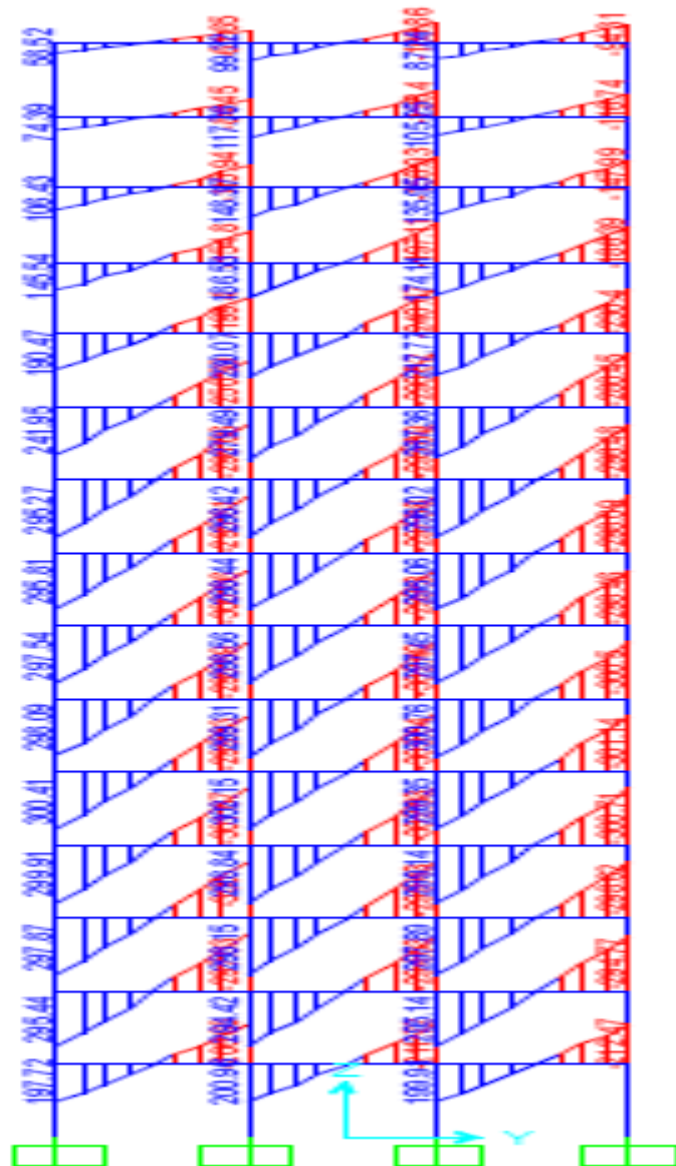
BENDING MOMENT DIAGRAM FOR THE 15 STOREY STEEL FRAME BUILDING BEAMS
